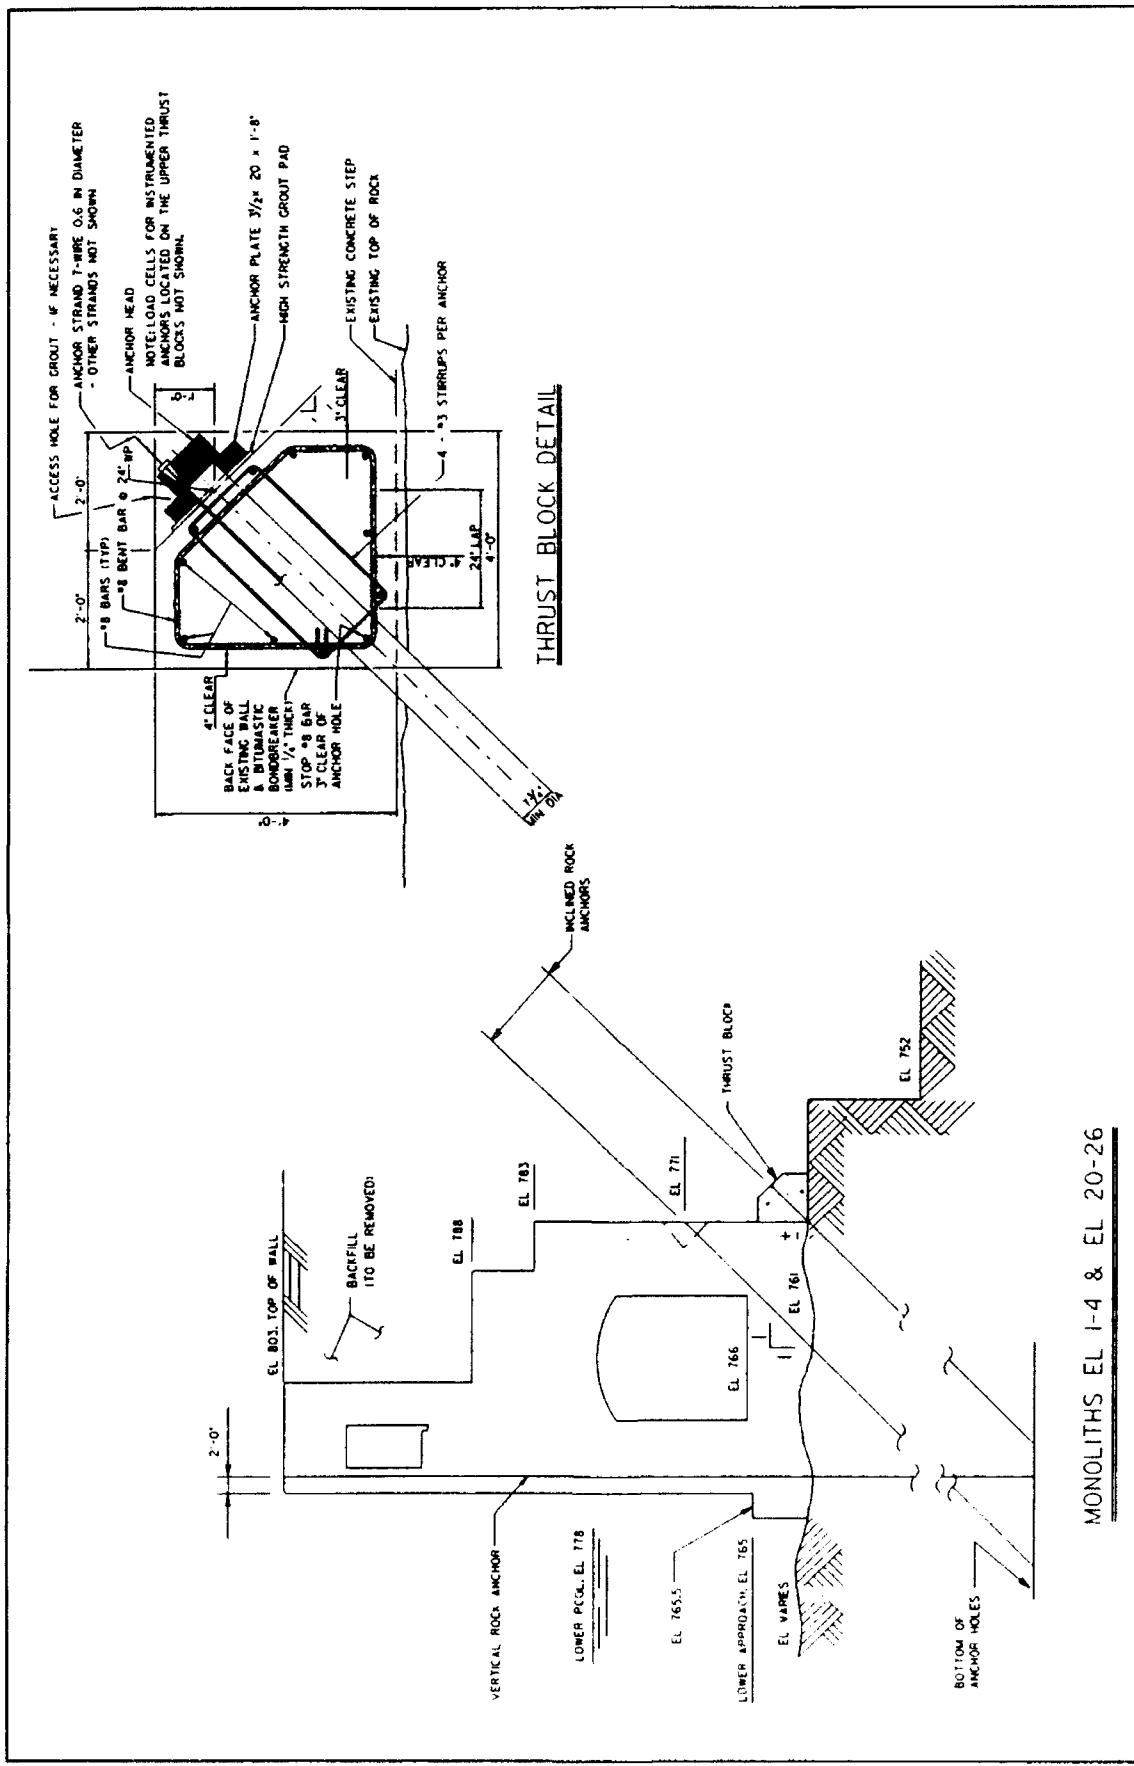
Point Marion Lock cofferdam existing land wall thrust blocks
